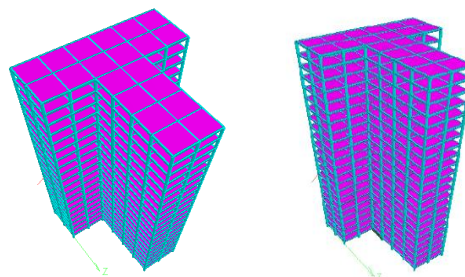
(a) T-Shape G+20 and G+22 Building without shear wall
